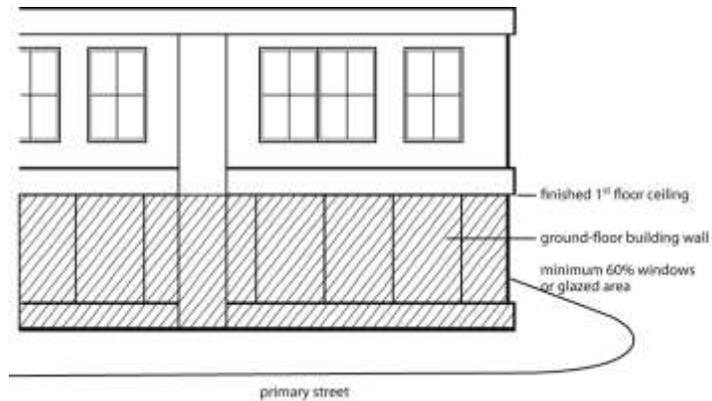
/P, Pedestrian Overlay, Ground-floor Glazed Area
